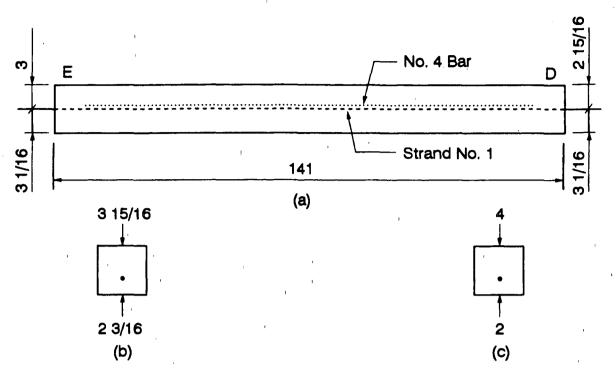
Specimen No. 17-6.0DC-9 (dimensions shown in inches):
